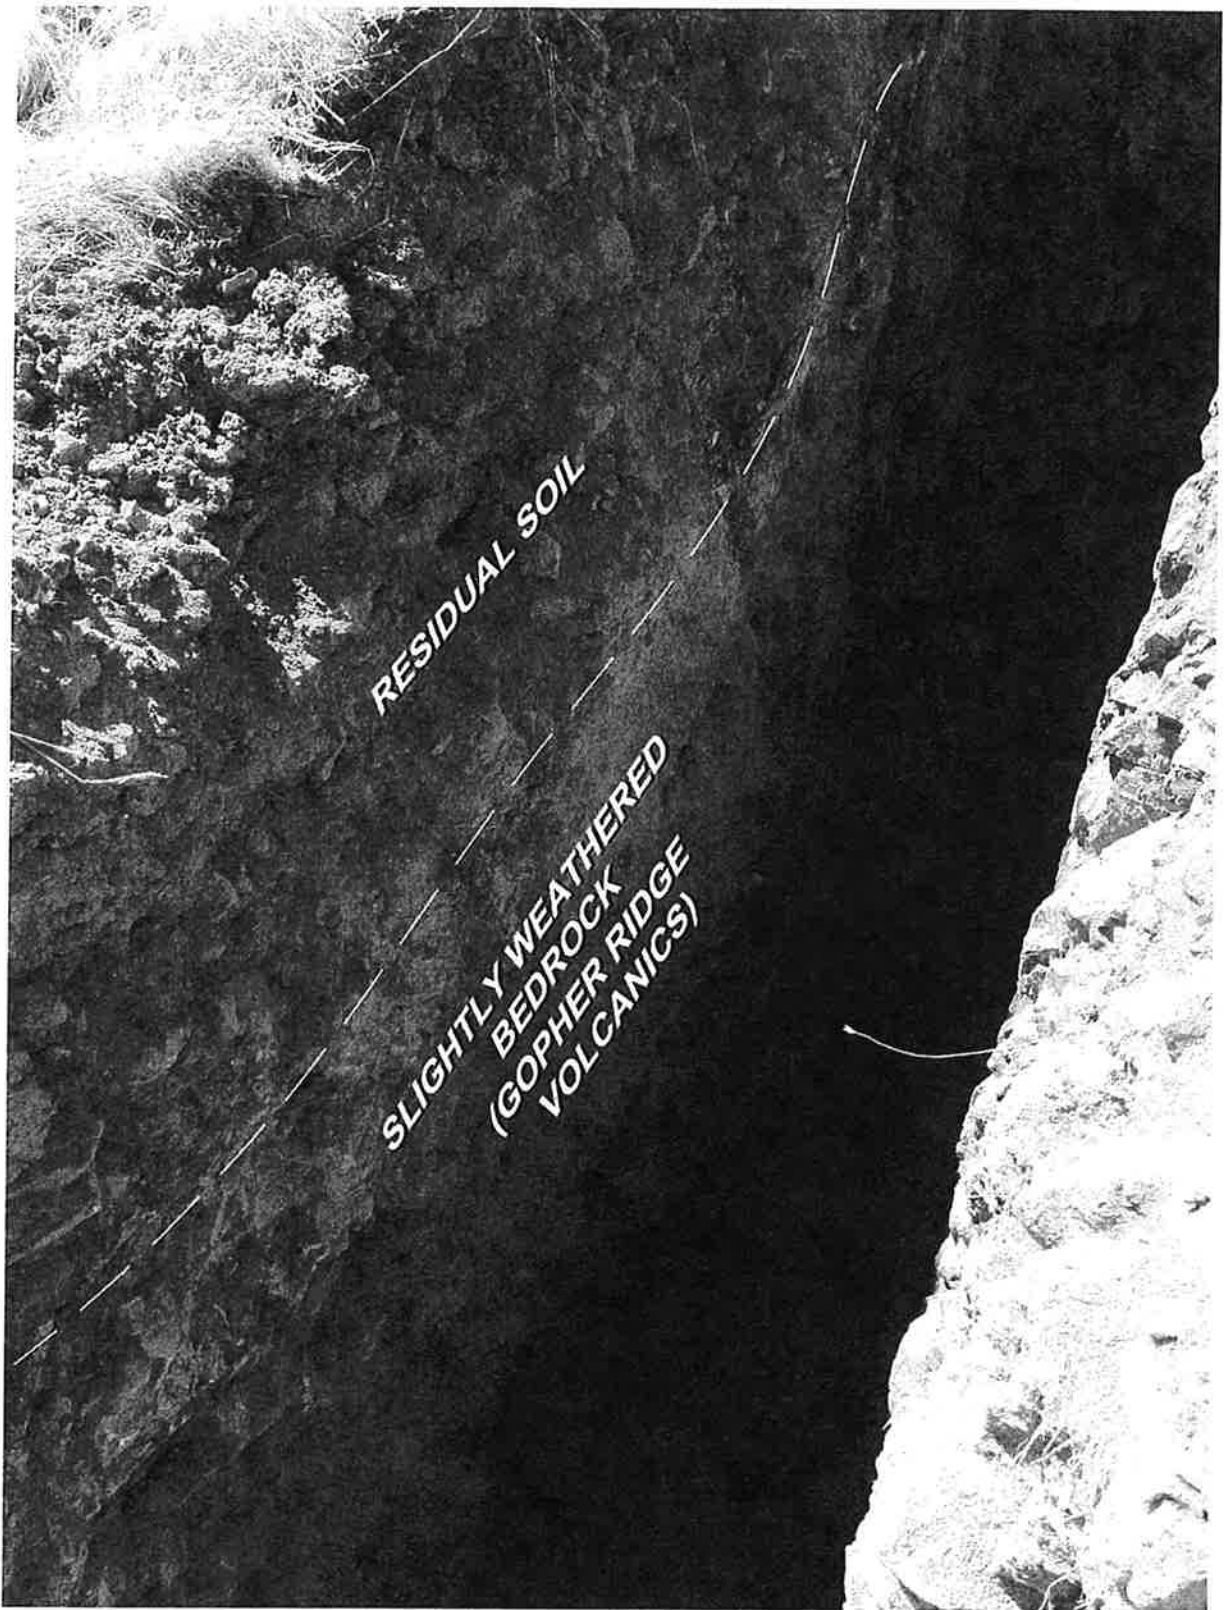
Typical transition between residual soil and bedrock - Test Pit TP-3
